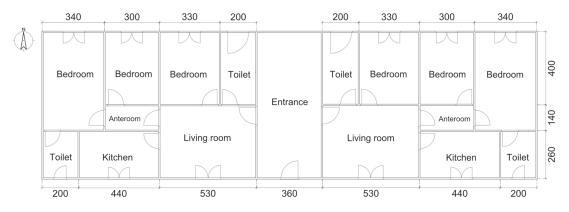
Plan views of one storey of the benchmark apartment block (dimensions in cm).
